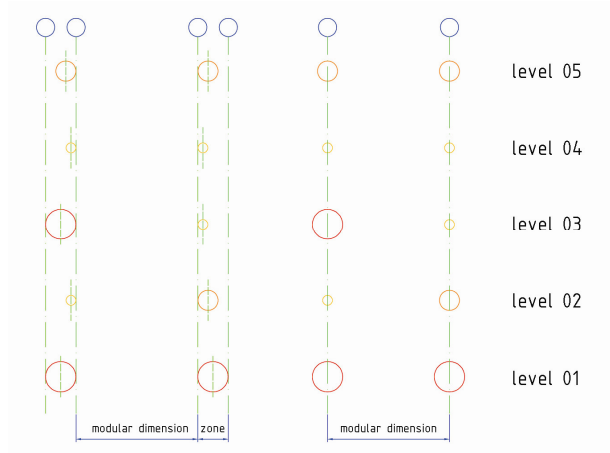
Unfavourable layout of the structural elements with a band grid
